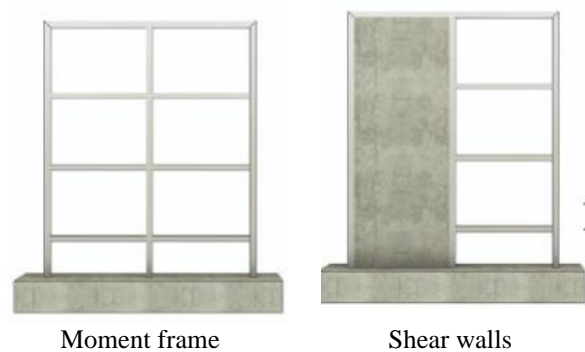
Two common types of lateral resisting system under reinforced concrete structure
